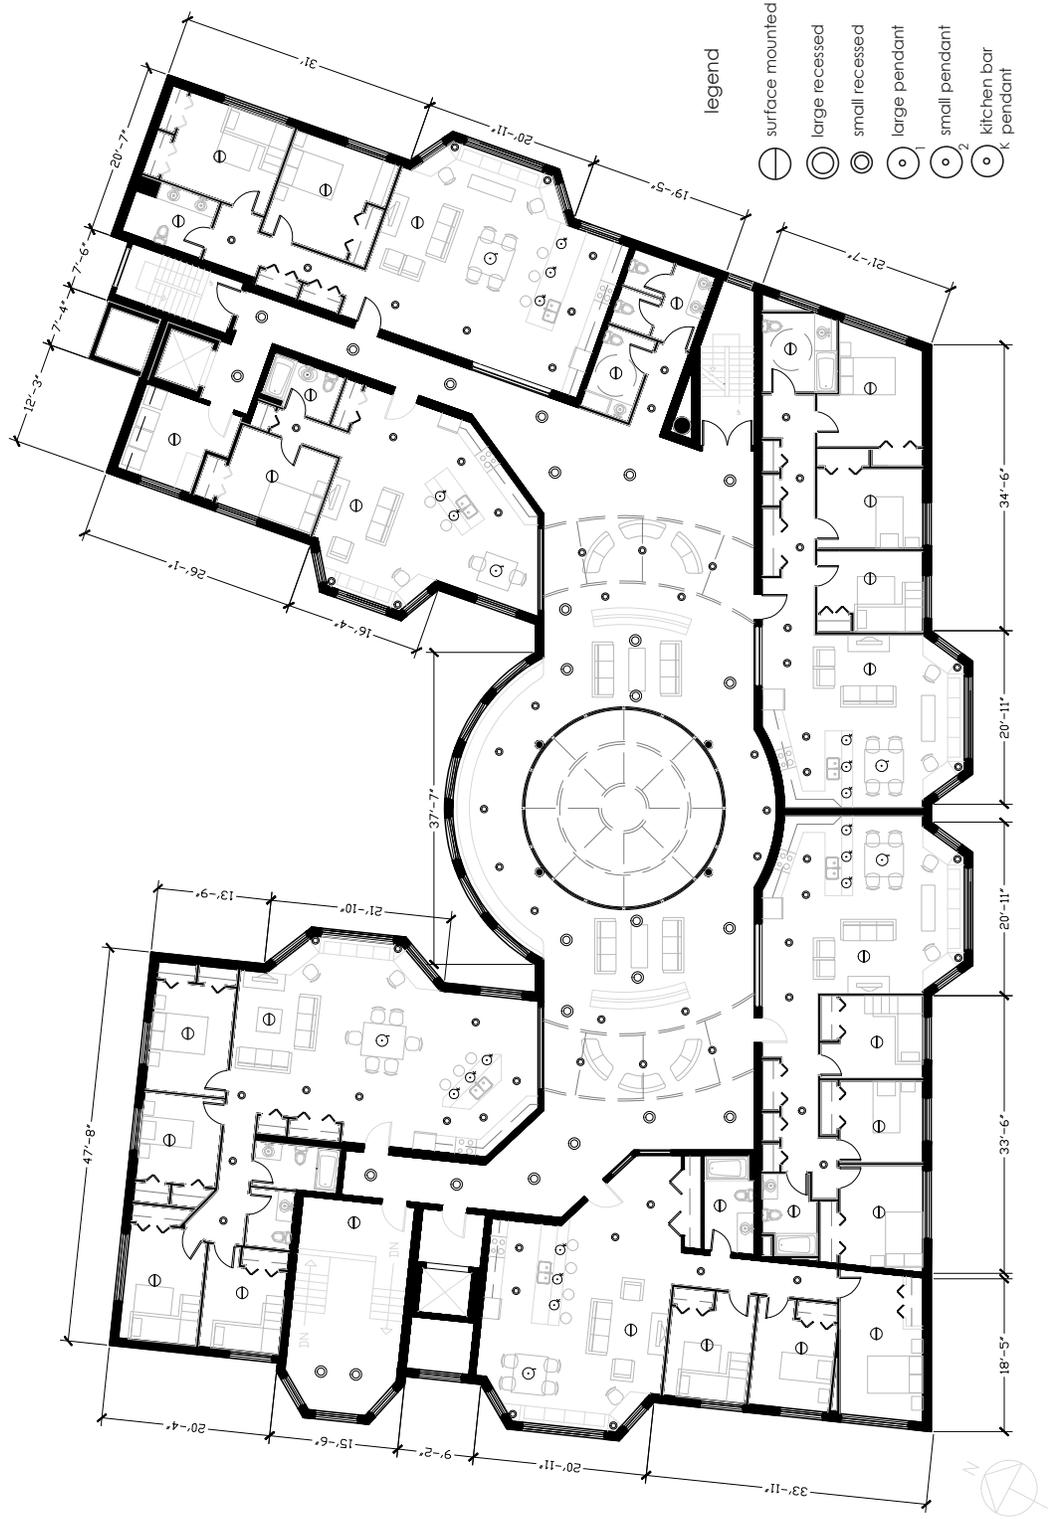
| FIRST FLOOR LIGHTING PLAN
